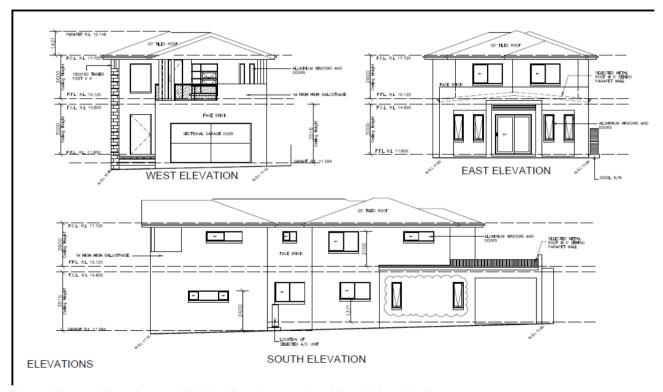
Proposed Development at 12 Septimus Avenue, Punchbowl (Inkon Plans)
